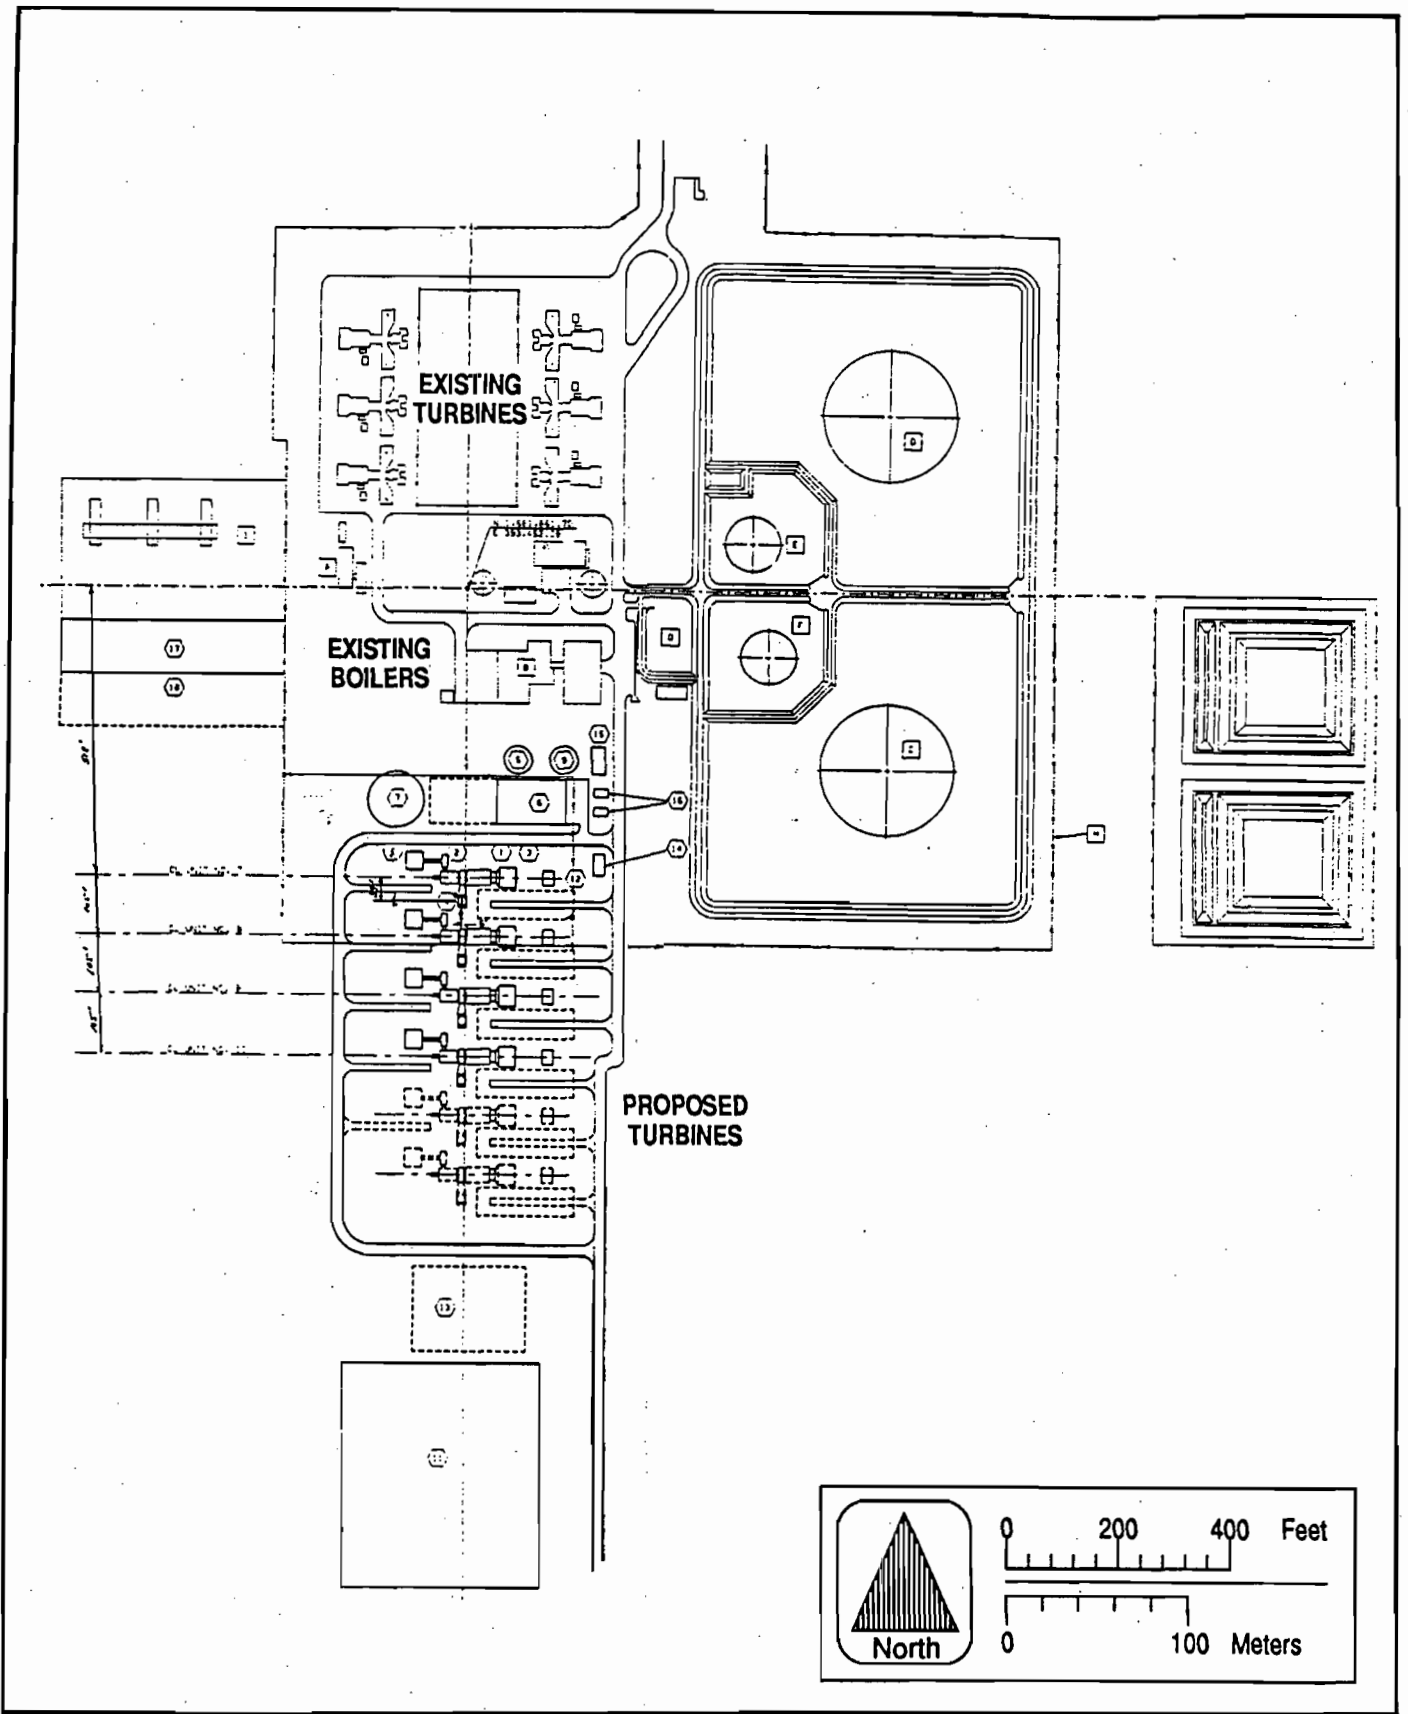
SITE PLAN OF THE EXISTING TURBINE AND BOILERS AND PROPOSED TURBINES
